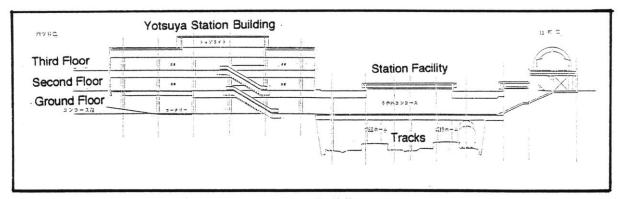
Section of the Yotsuya Station Building Source: East Japan Railway Company, Proposal for the Yotsuya Station Building, 1987.
